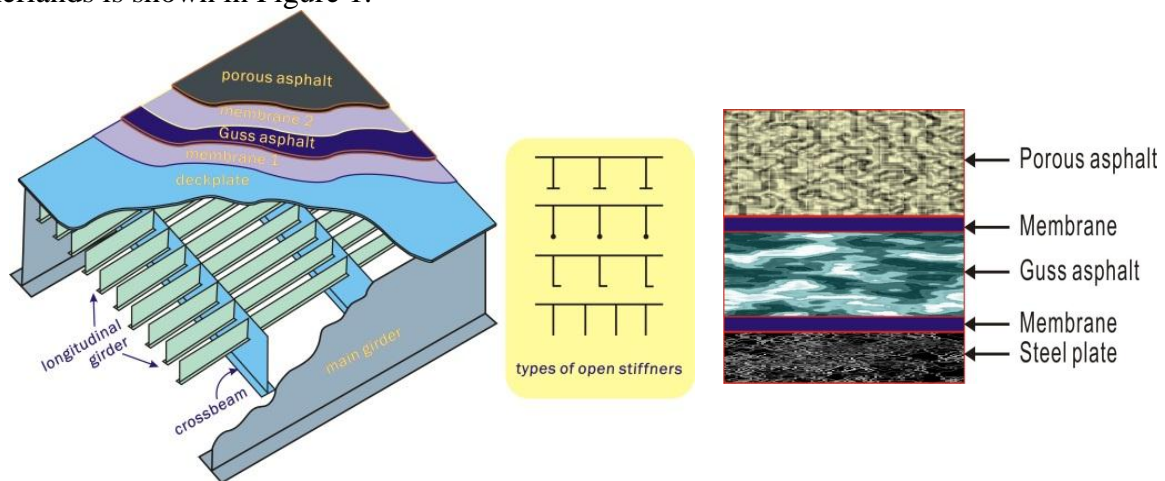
A typical layout of an OSDB with two-layer surfacing system
